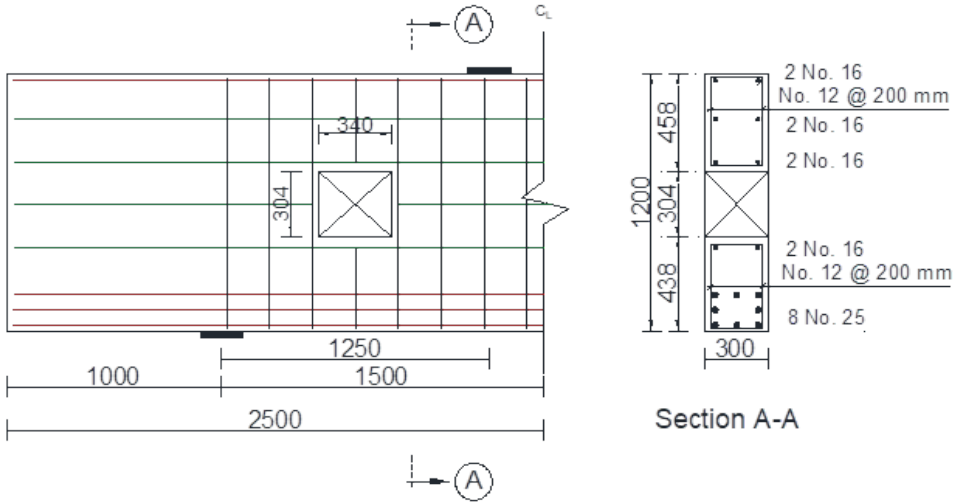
Details of DB-O1 (Dimensions are in mm)
